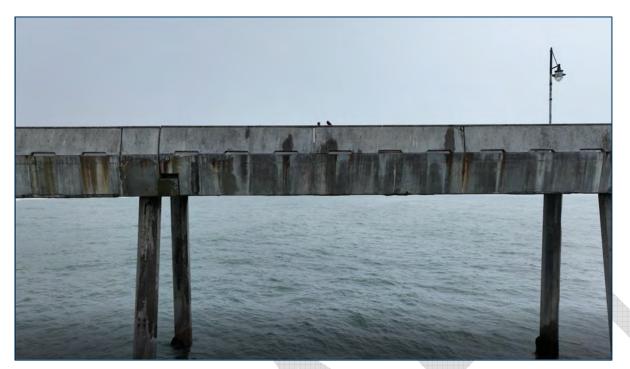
Deck Exterior around Bent 1N - North Face
